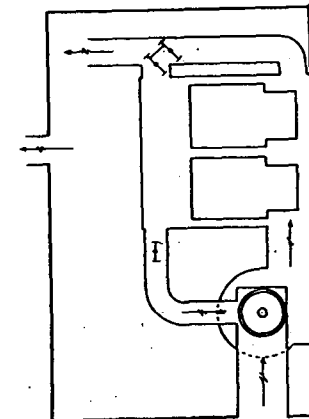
HEATER ARRANGED FOR OUTSIDE AIR WITH WARM AIR CONNECTION TO FAN INLET TO TEMPER AIR, ALSO MIXING DAMPERS FROM WARM AIR AND TEMPERED AIR CHAMBERS
